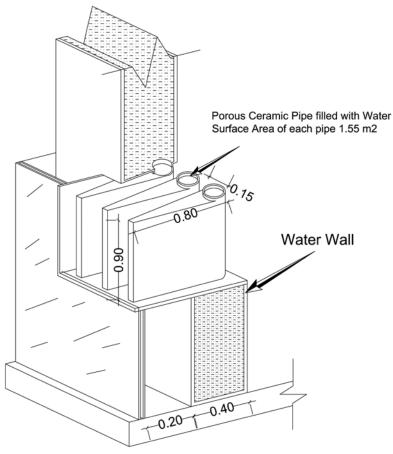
Isometric showing the Pottery Water Wall components and Pipe fixing in the wall.
